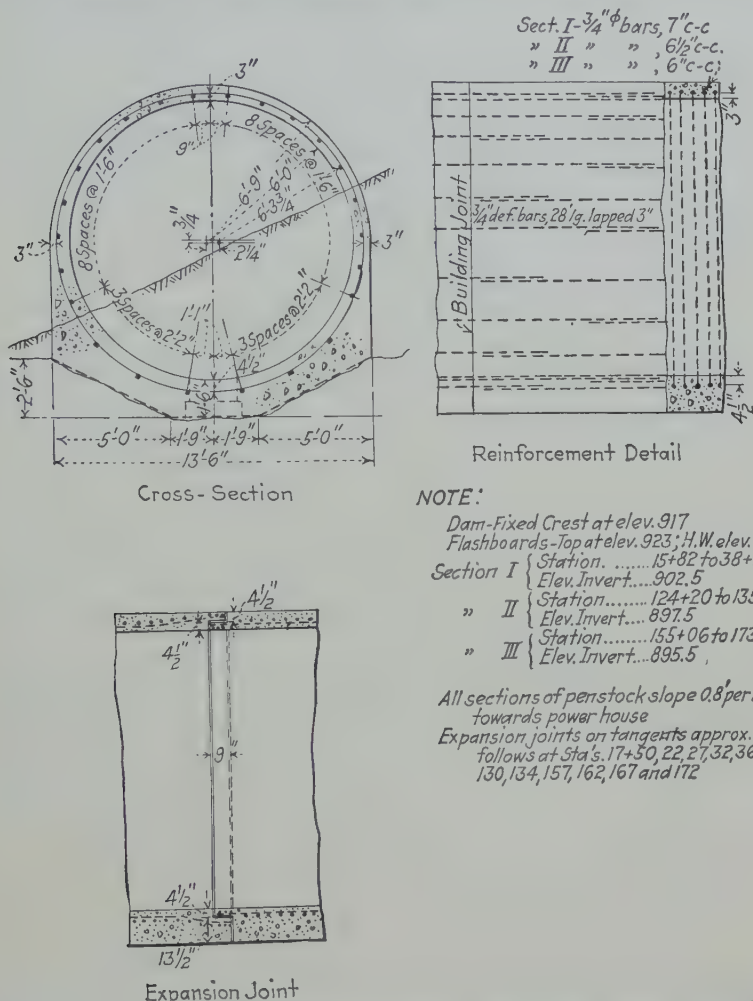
Twelve-foot concrete penstock details, Plant 5, New England Power Company.
